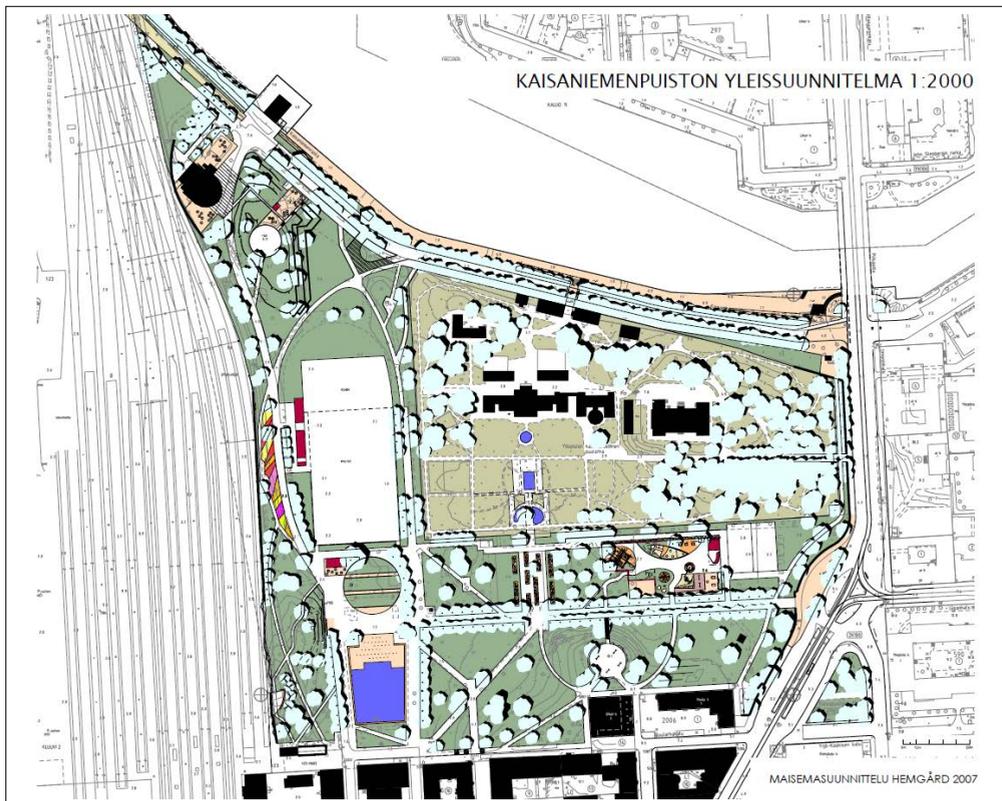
The park plan Kaisaniemi of 2007 by Gretel Hemgård. The plan seeks a balance between preservation and renewal. Helsinki City Planning Department.
